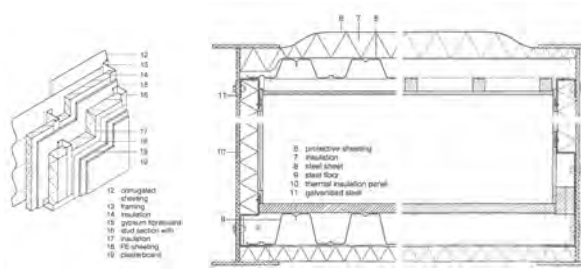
Example of a wall construction and a section through a steel room module.¹⁰⁰
